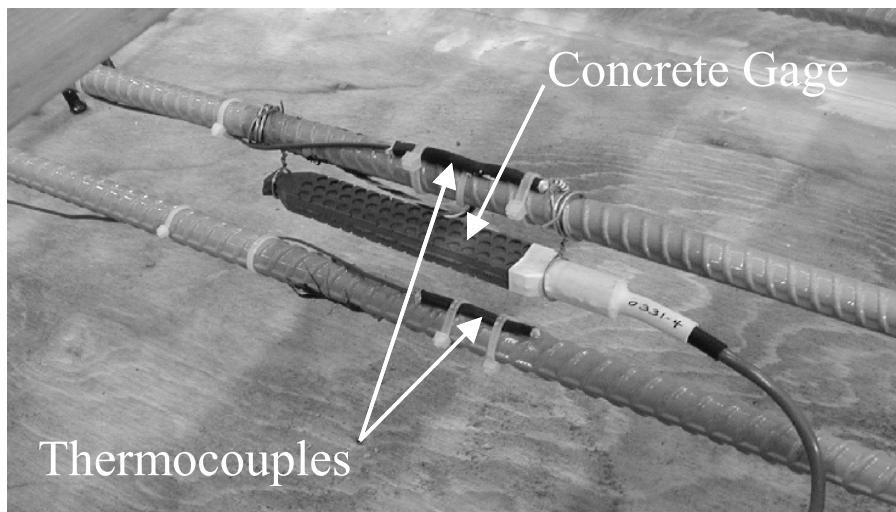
Location of Internal Concrete Gage and Thermocouples (Specimen 7)
